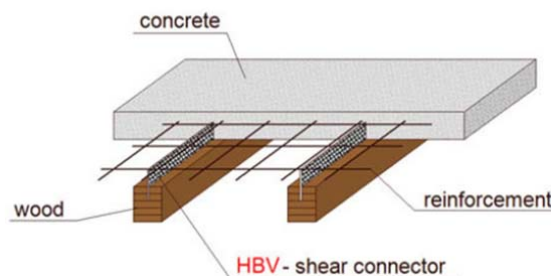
example of prefabricated wood-concrete composite floor panels, Bathon and Graf (2000)
